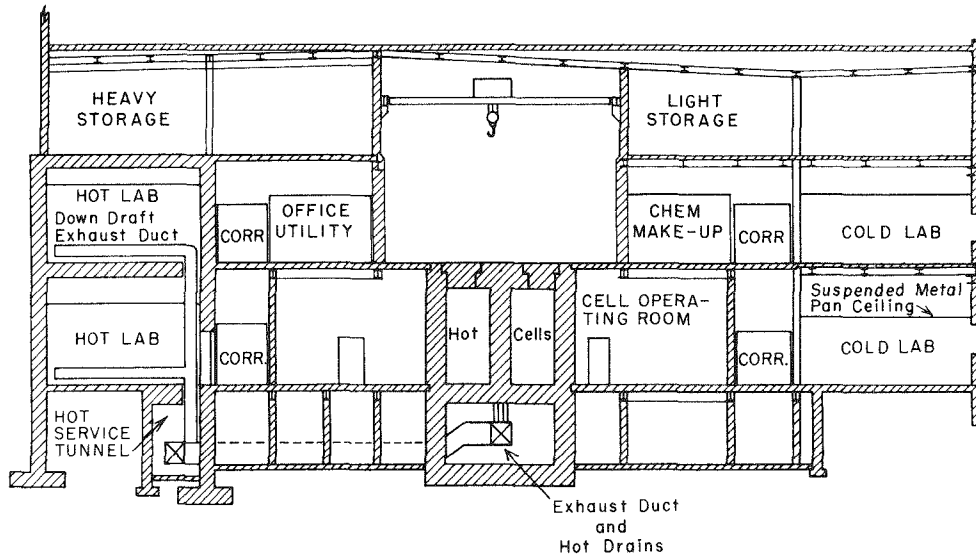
Plan of isotope research facility, High-level Radiochemical Laboratory, building 4501, Oak Ridge.
